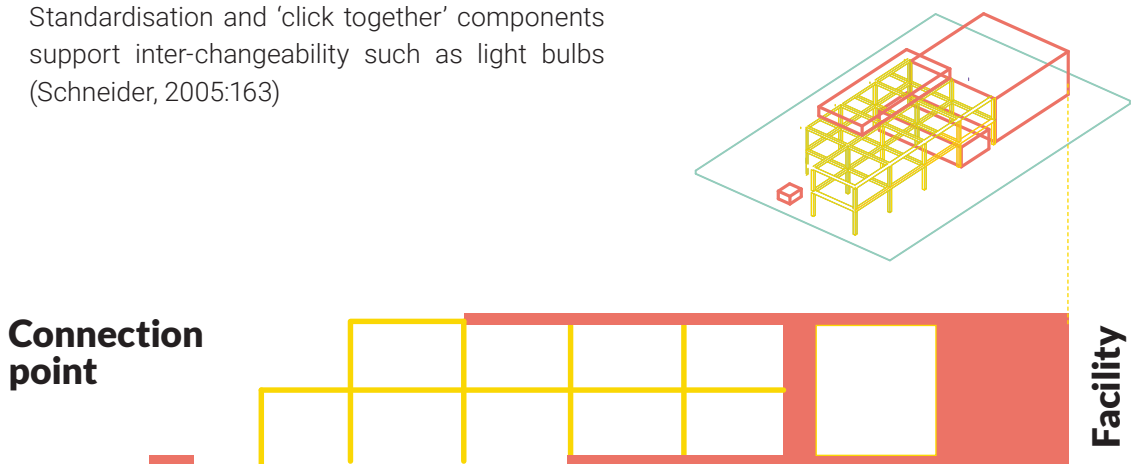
Diagram of connection and facility in stable built fabric (author, 2017)
